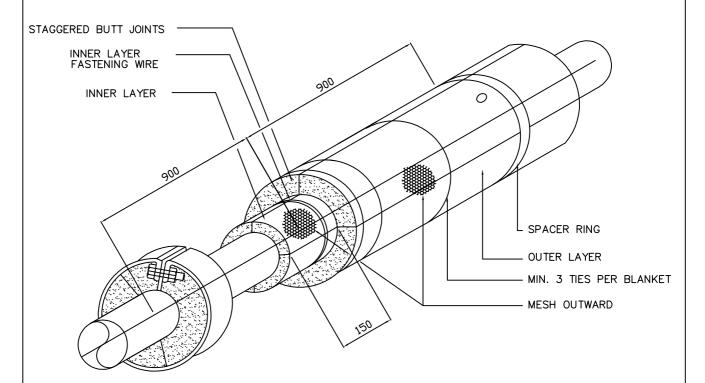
MULTIPLE LAYER BLANKET INSULATION WITH ALUMINIUM SHEET FINISH
